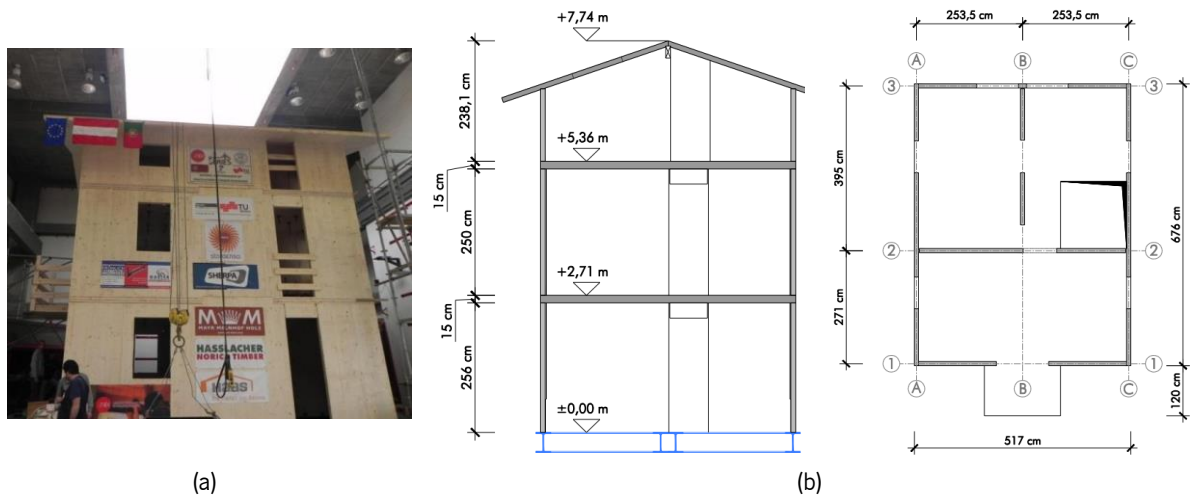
Panoramic image (a) and plans (b) of the 3-story building tested at the LNEC [26]
